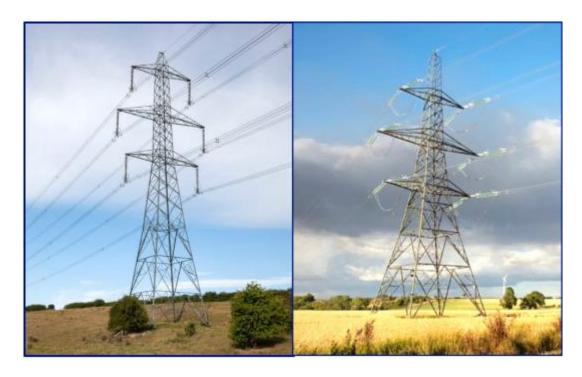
Suspension Pylon (Left) and Angle Pylon (Right)
